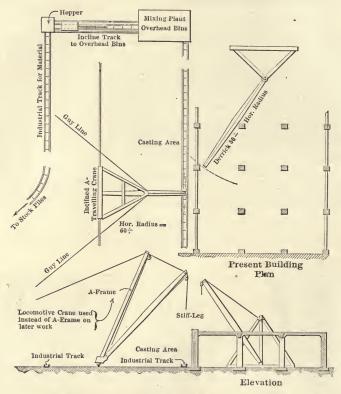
ARRANGEMENT OF PLANT, RANSOME UNIT SYSTEM. (FROM CEMENT AGE.)
